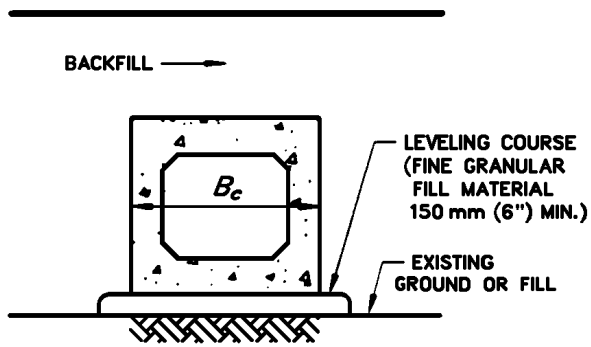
Design Nomenclature for Embankment or Trench Condition Precast Concrete Box Sections
